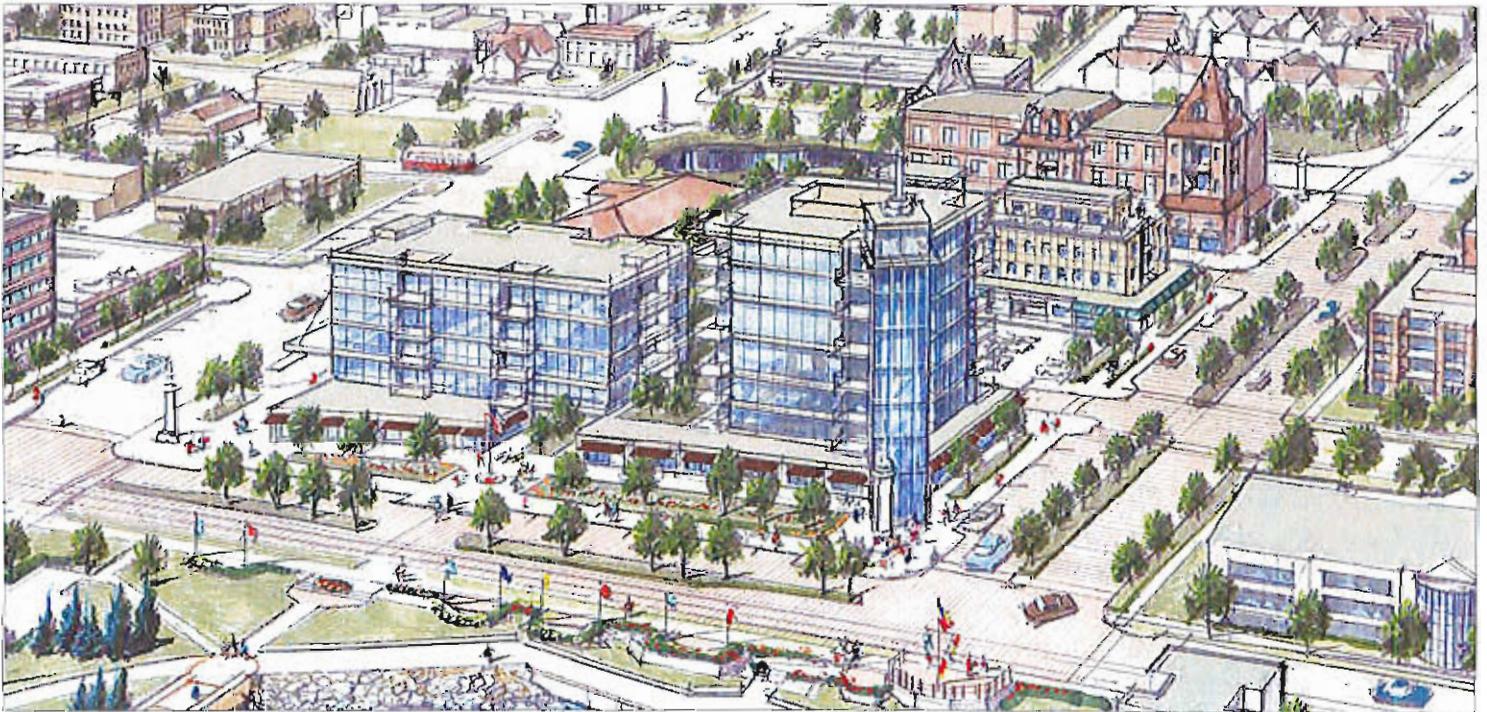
Bird's Eye Rendering of Envisioned City Hall Redevelopment Site - viewed from Kenosha Harbor looking west
